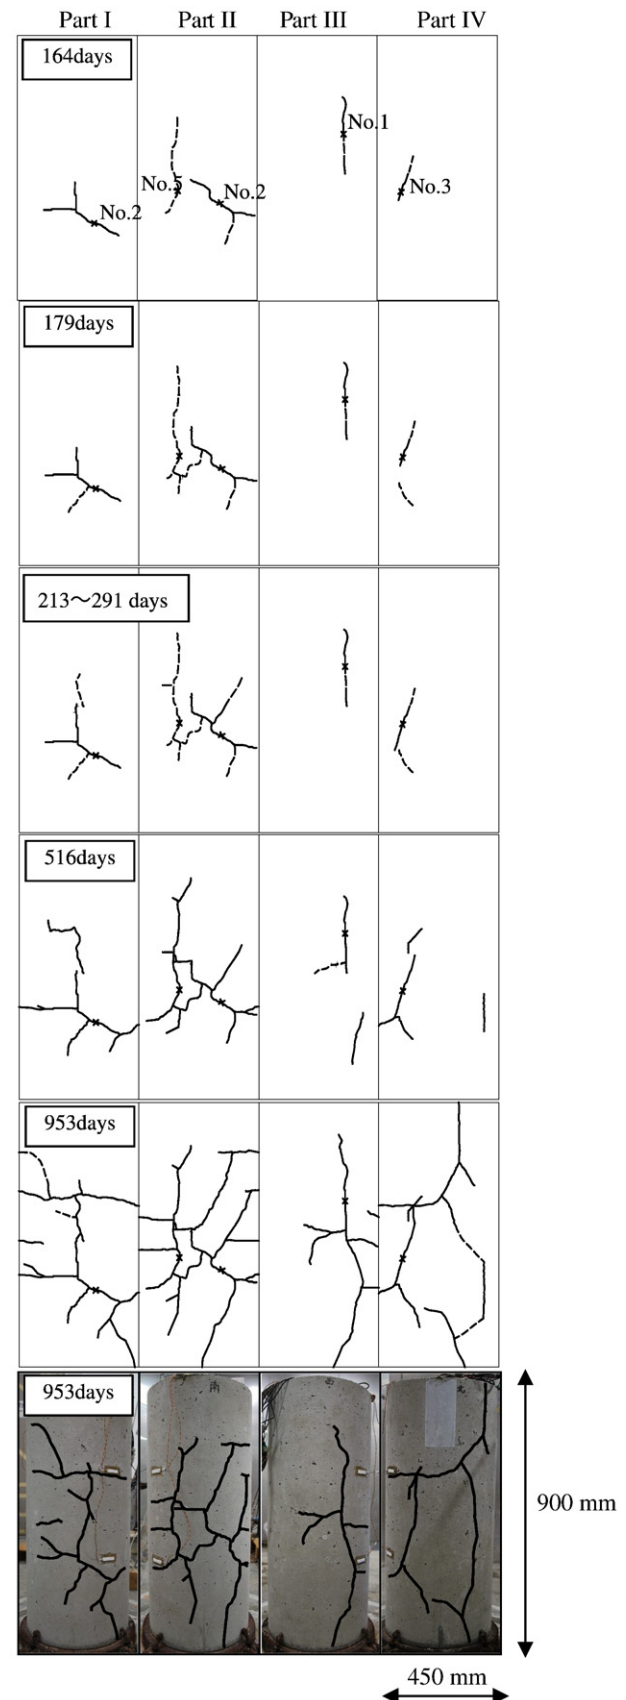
Sketches of surface cracks on a reactive concrete cylinder in the drying and re-saturating process.
